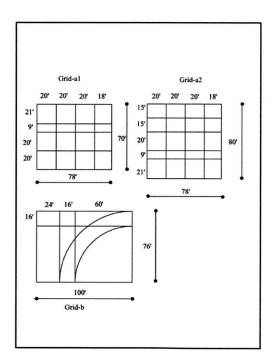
Site plan with grid-a1, a2 and grid-b
